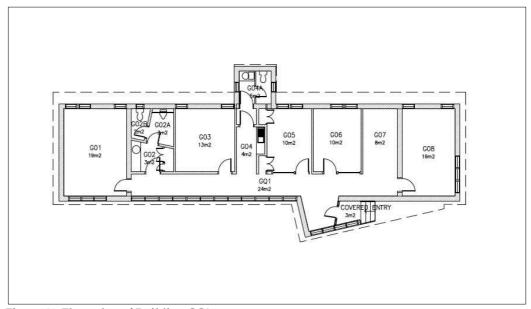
Floor plan of Building CC2. UNSW Information Services. Plan last modified July 2010.
